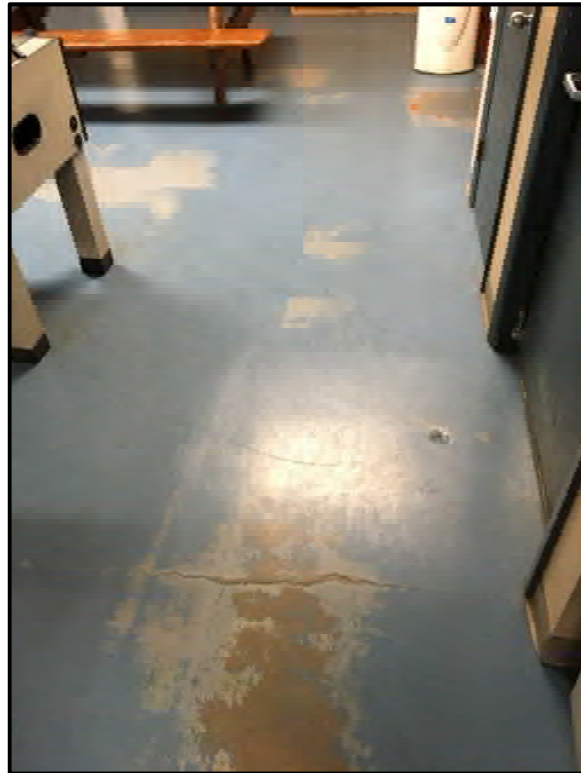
Cracking in Mezzanine Slab on Metal Deck at Break Room
